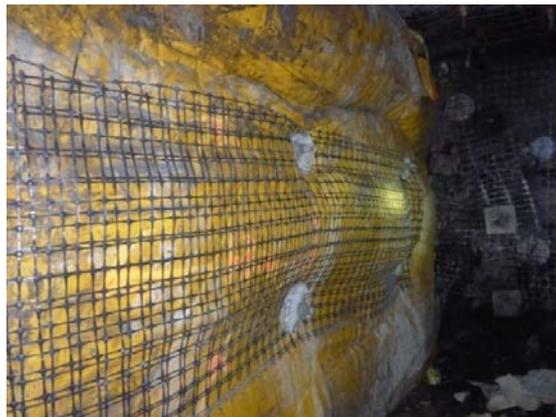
Heavily loaded grout pillar immediately prior to holing Longwall 11 PDRR
